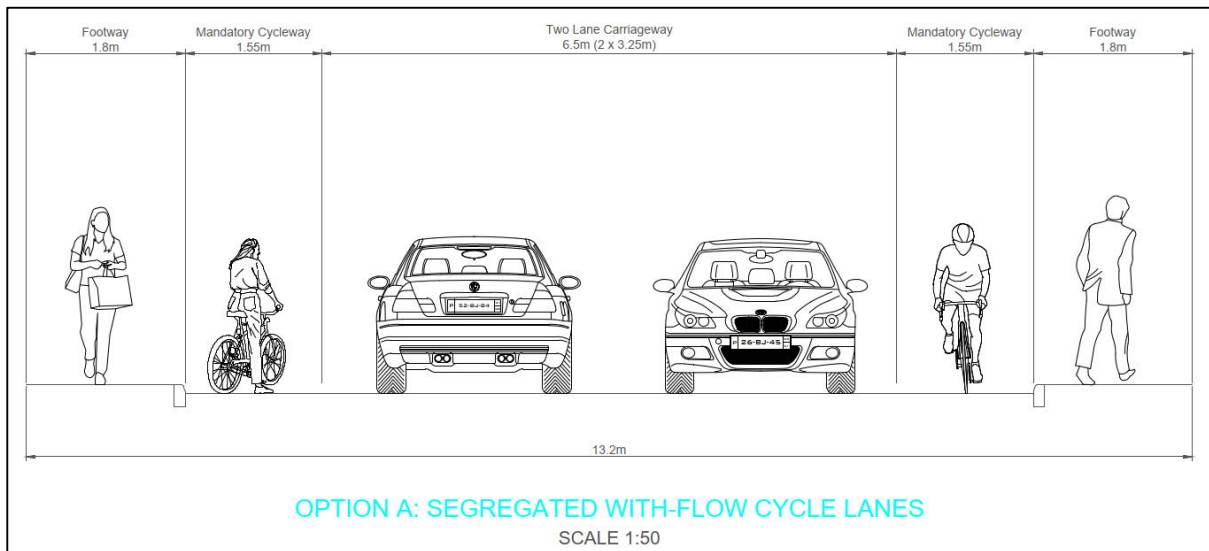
Holburn Street - With-Flow Cycleway Cross Section
